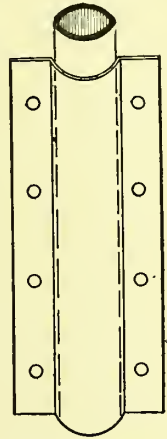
Lead Soil Pipe protected by Sheet Iron
